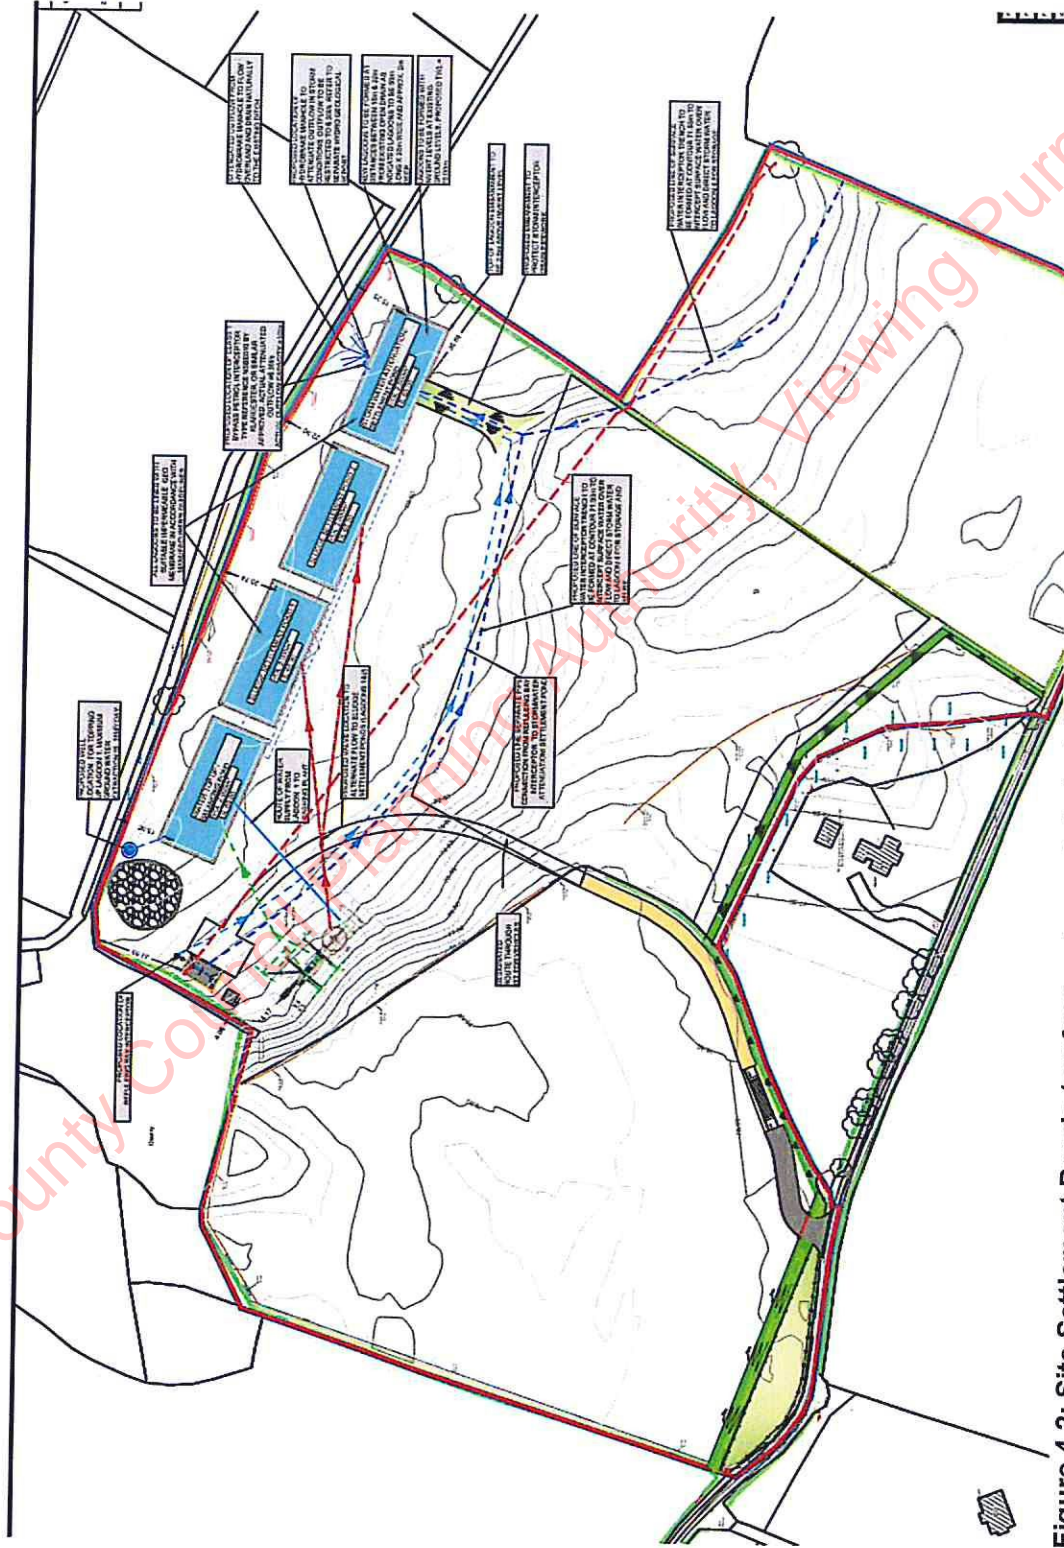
Site Settlement Ponds (surface water and sludge) (Ref: extracted from the planning drawings)
